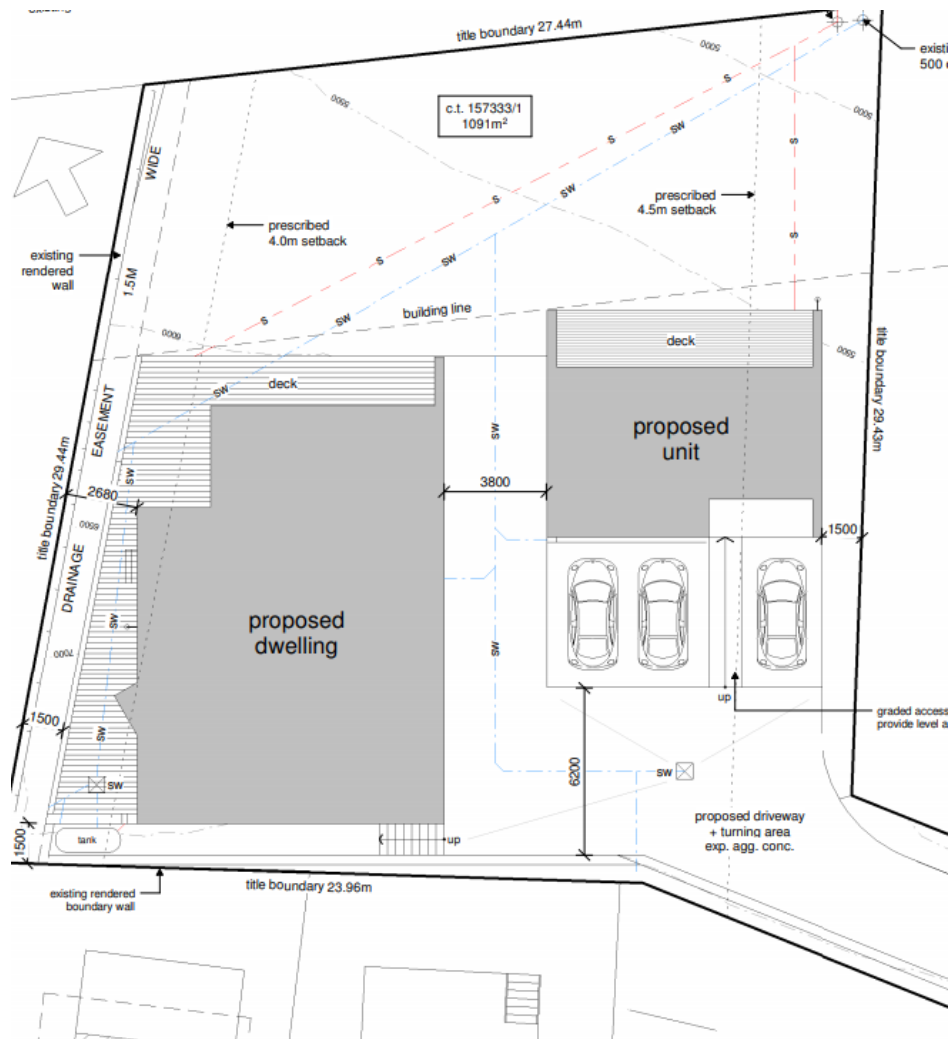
Site Plan showing the proposed dwelling and visitor accommodation unit (Application Drawings by Jennifer Binns Design)
